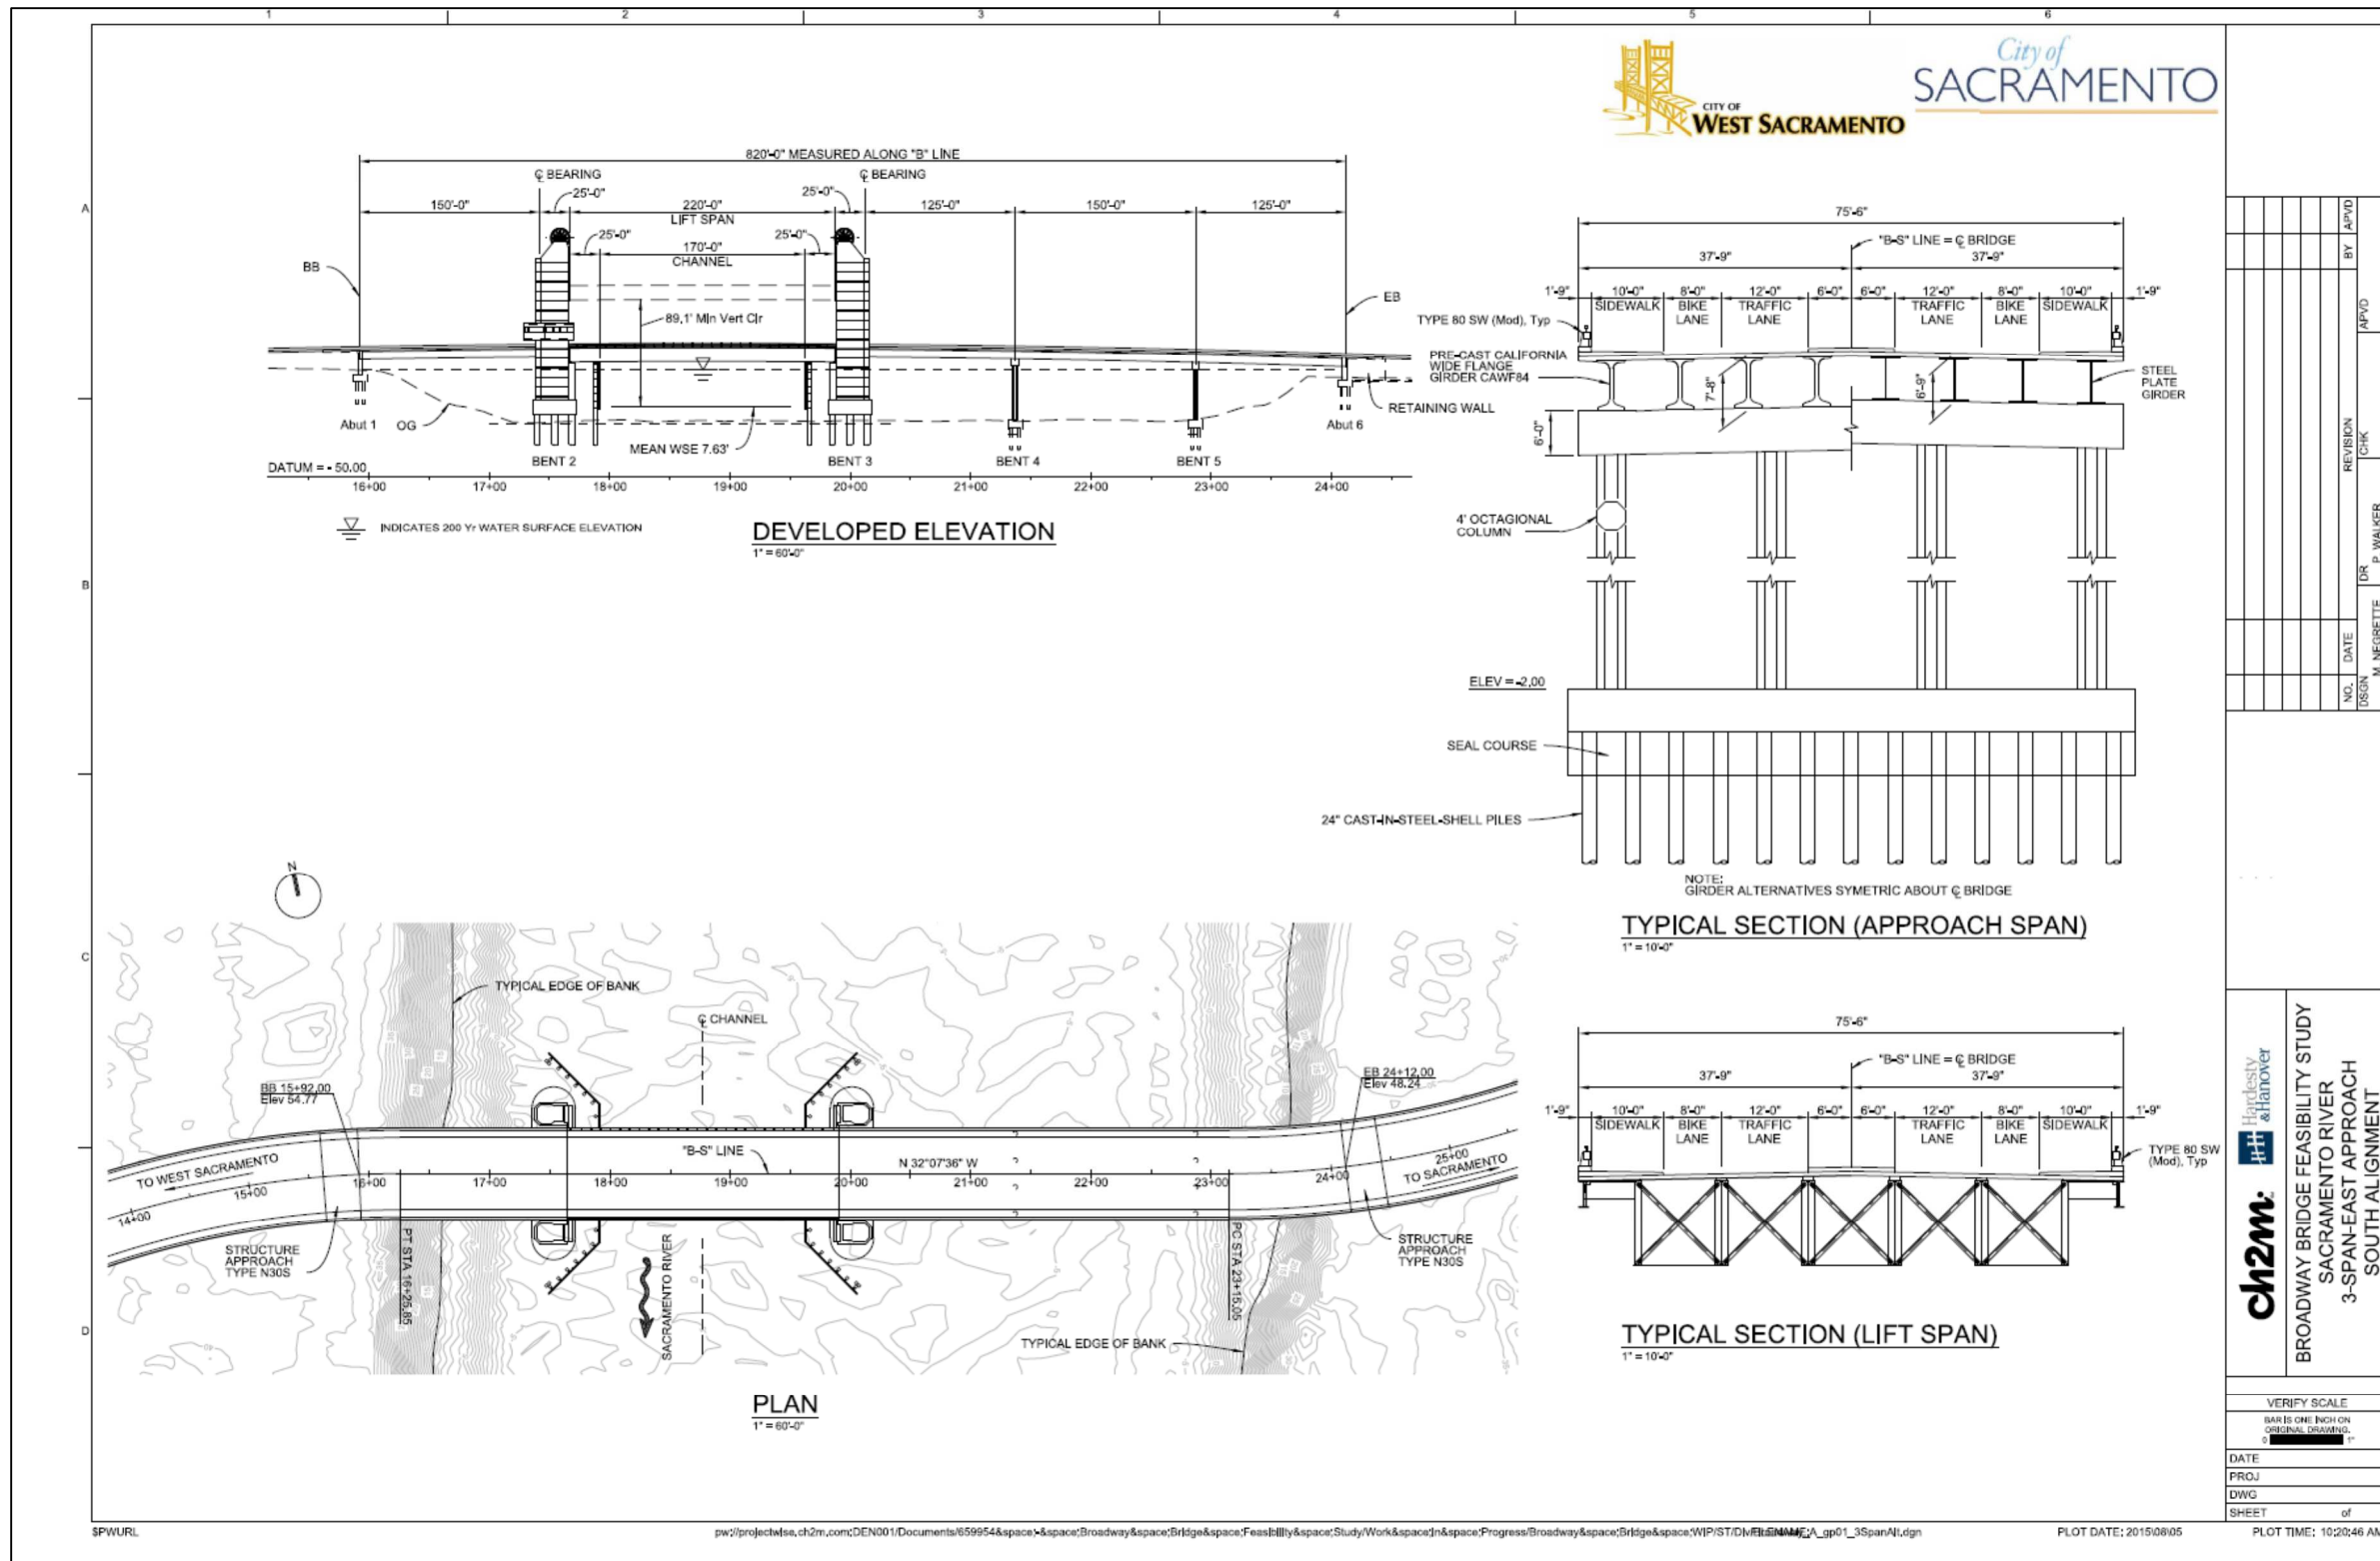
Proposed Bridge General Plan, Vertical Lift Bridge
